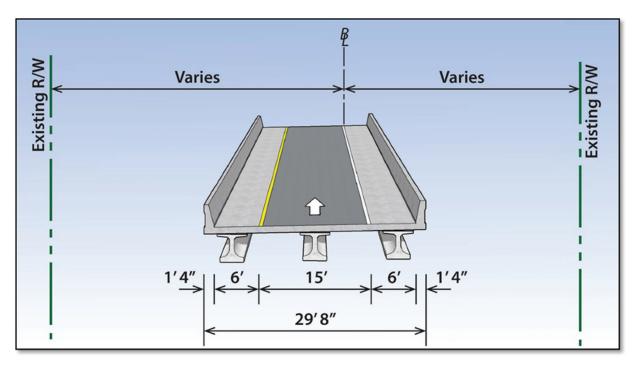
Proposed Typical Section – Whiting Street Off-Ramp (On-structure)
